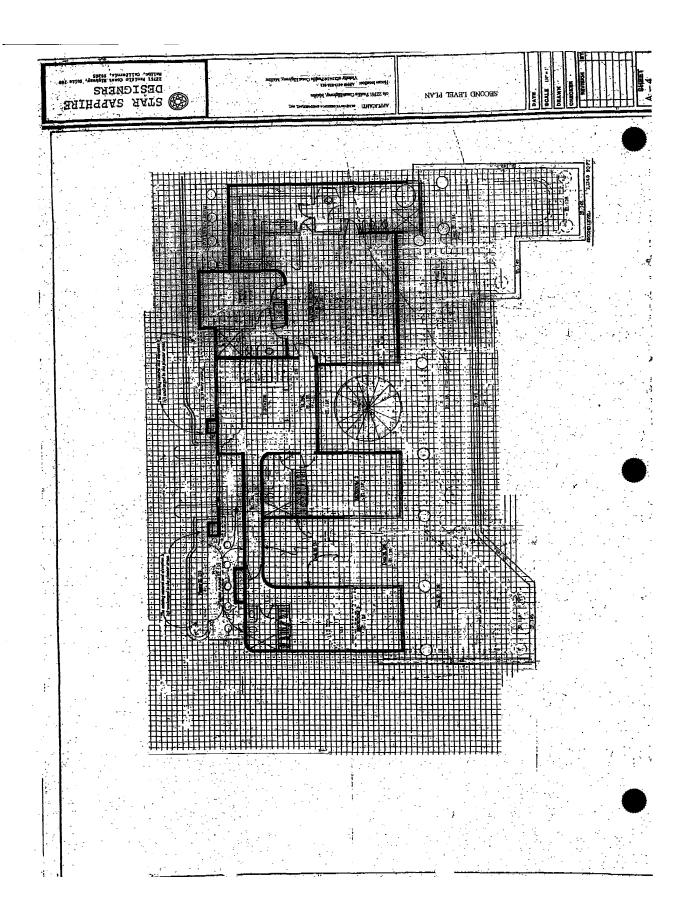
A-4-MAL-05-164 Second Level Plan
